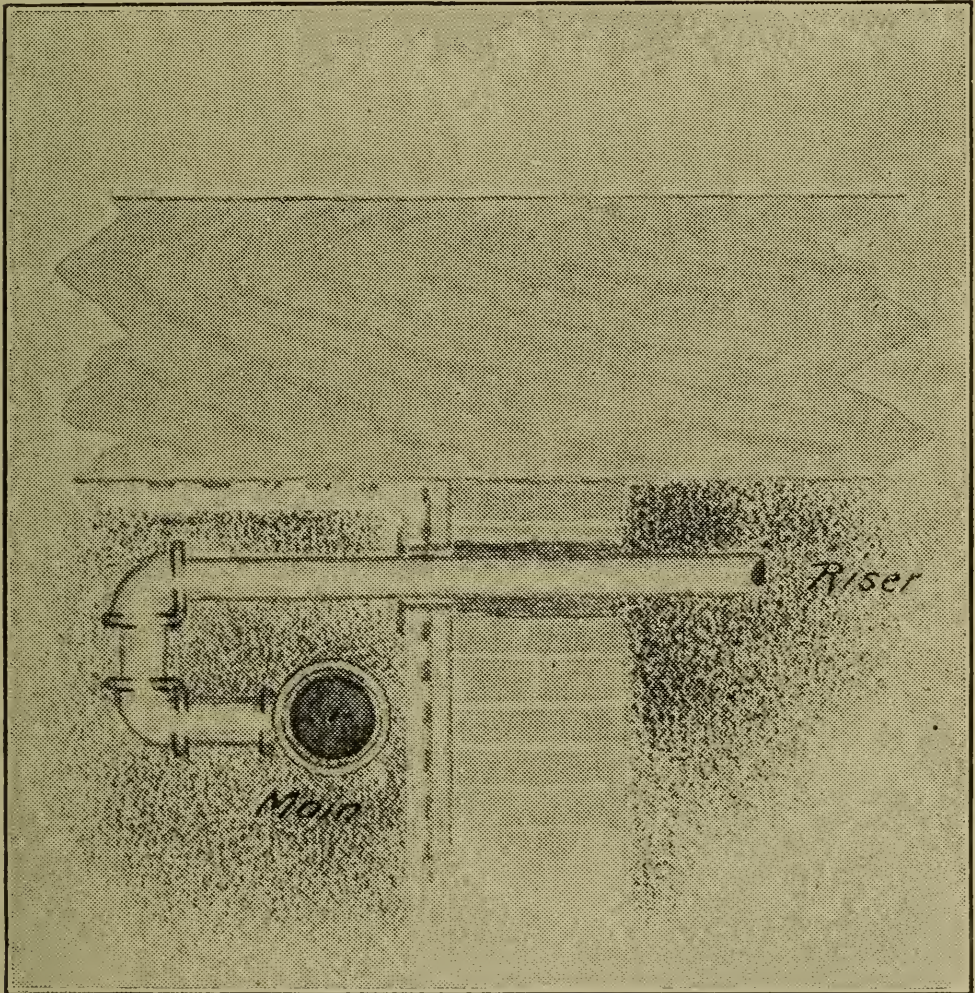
Connection from main to riser where head room is very short and expansion great.
